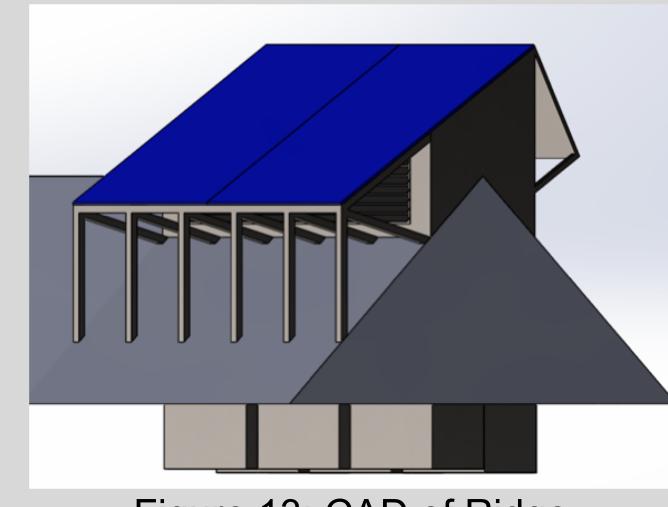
CAD of Ridge replacement structure with Solar Panels, Sitting on Roof.
